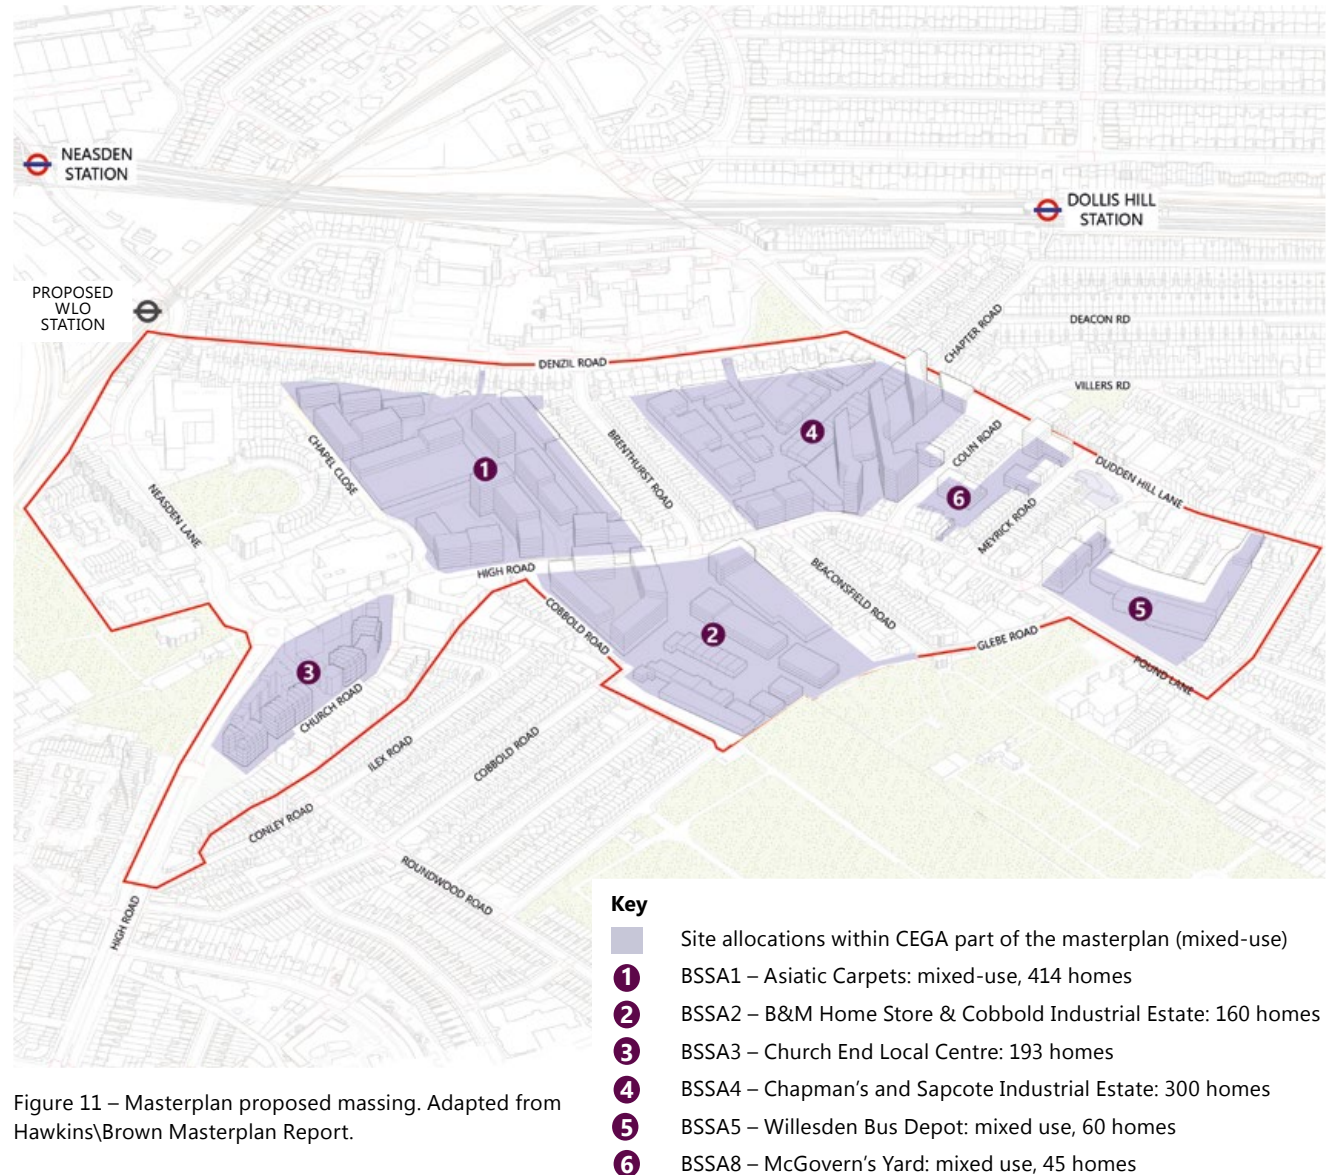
Masterplan proposed massing. Adapted from Hawkins\Brown Masterplan Report.
